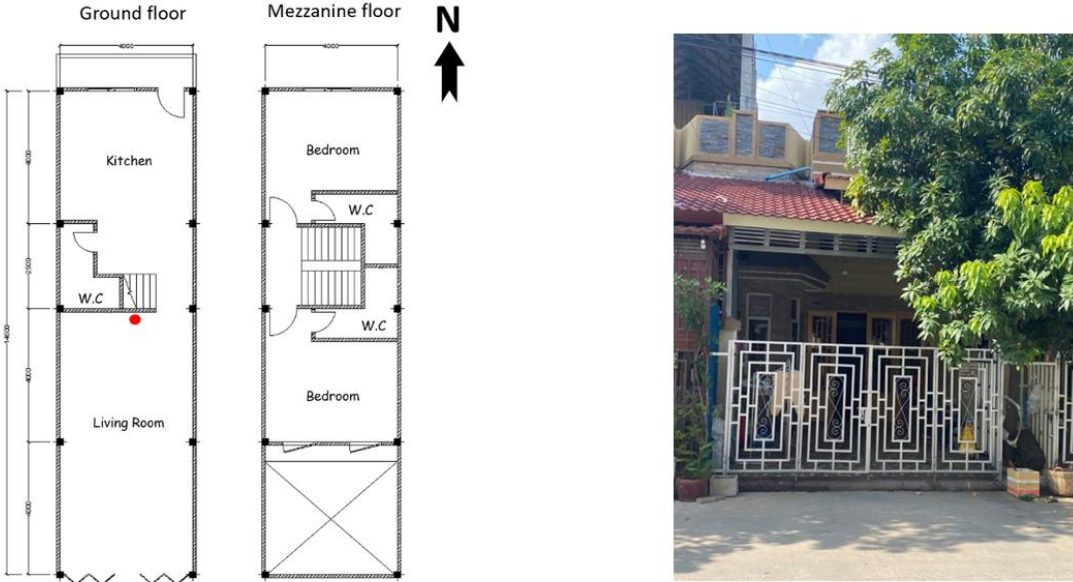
Floor plan and the surroundings of building T2 (the red dot is where the sensor was installed).
